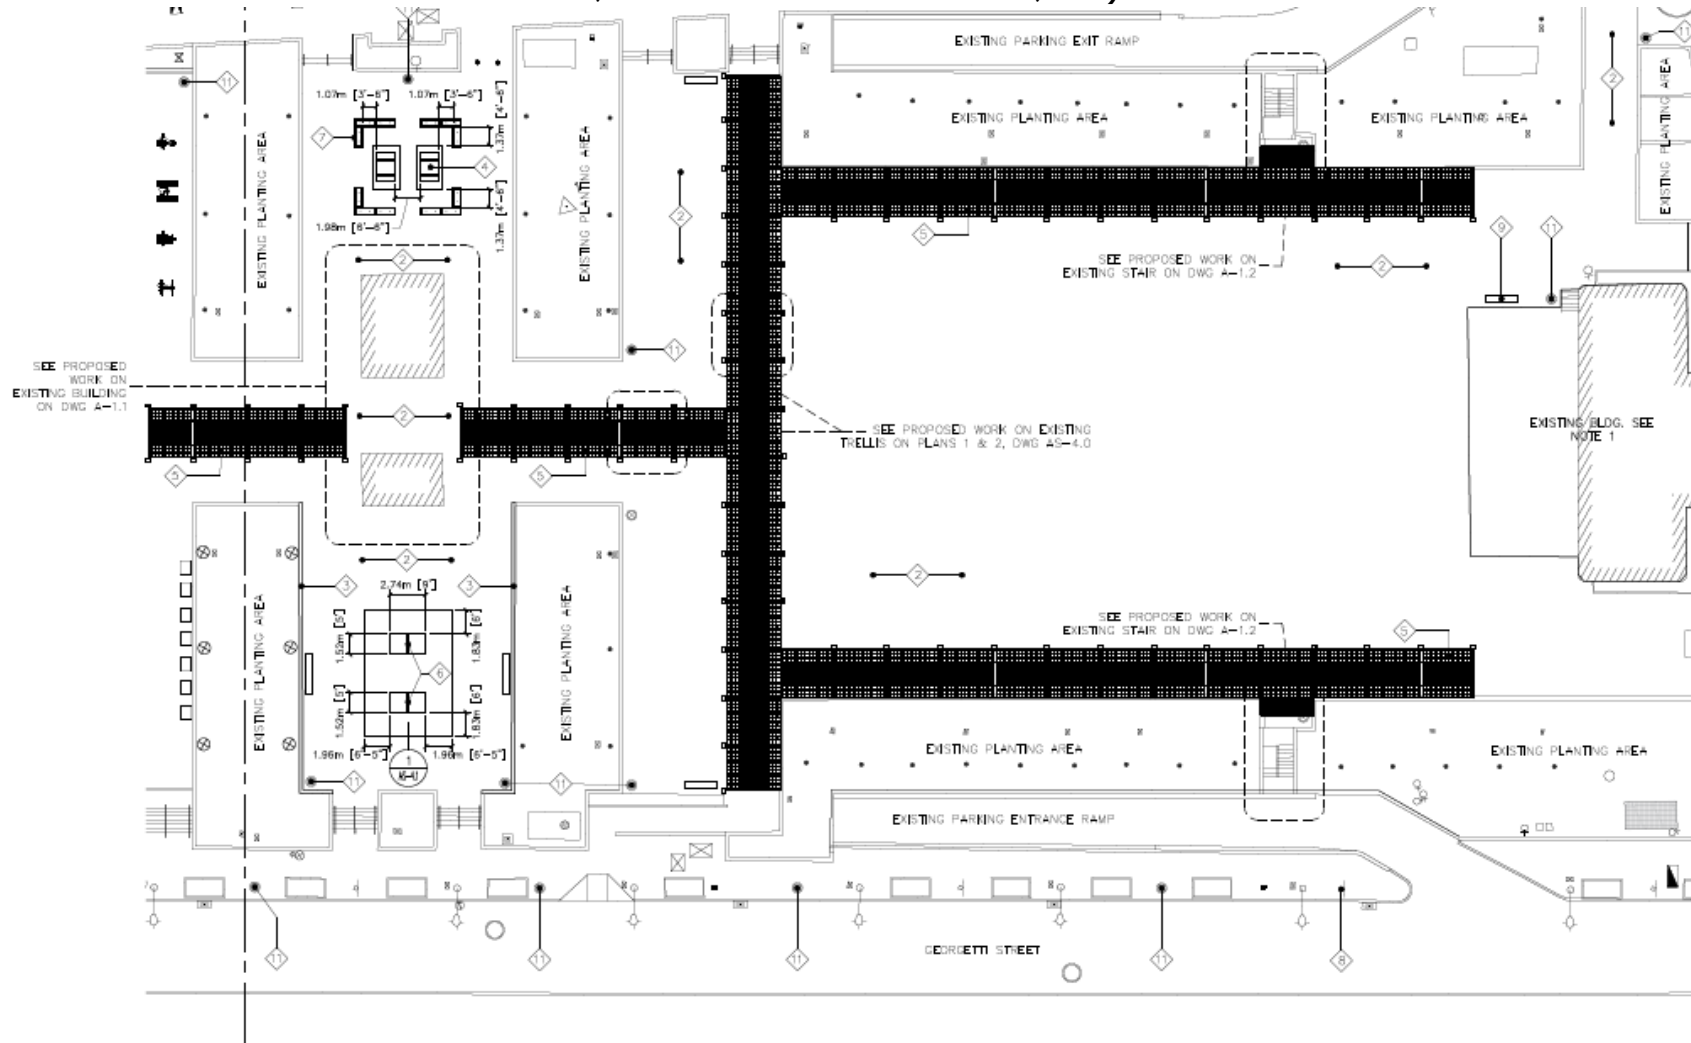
Plaza de la Convalecencia. Proposed plaza site plan. (Source: Drawing AS-4.0, Hernández-Bauzá PSC Architects, 2024)
